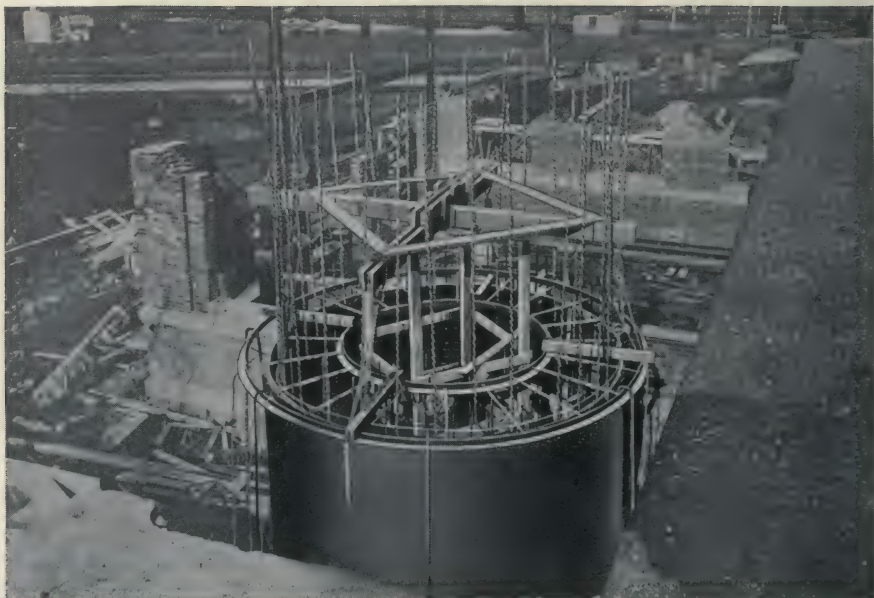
Steel Forms and Reinforcing Rods in Place to Receive Concrete.
